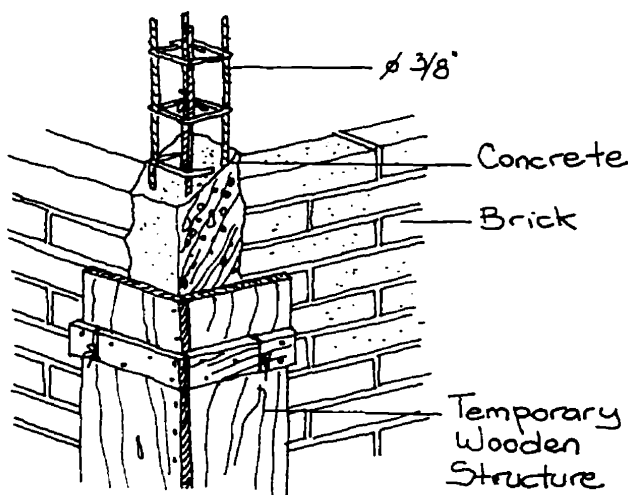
Traditional corner columns (After Yruegas, 1978)
